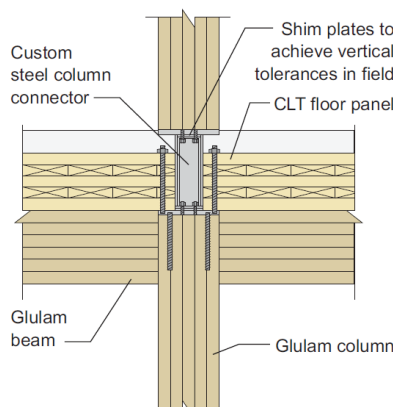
Column-to-column connection details, with vertical load path isolated from beams and panels
